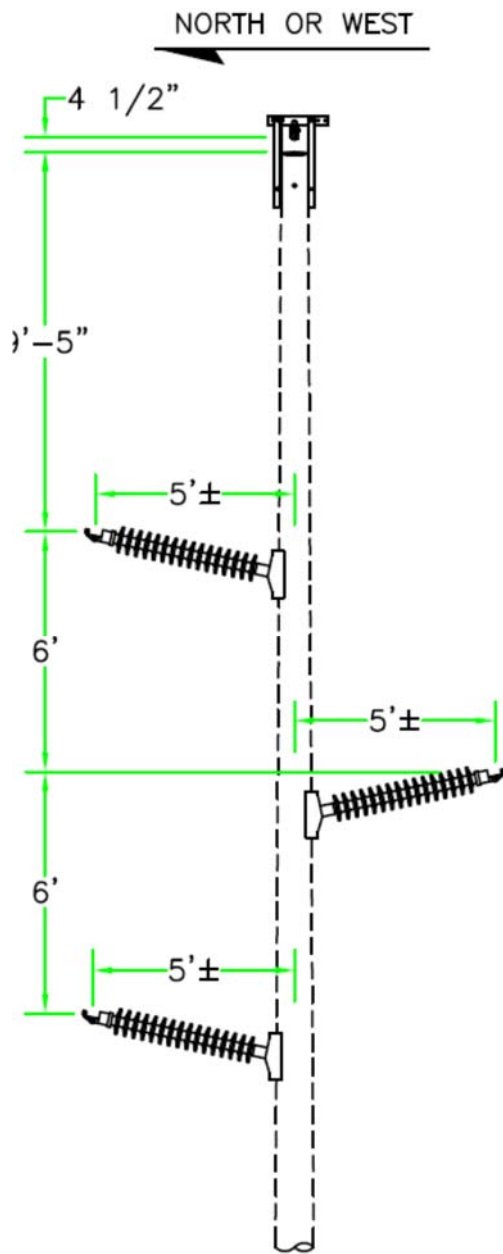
Typical Monopole Horizontal Post Insulator Structure
